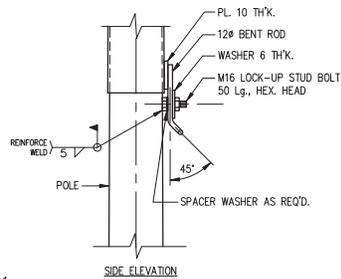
BRACKET FOR 3 FLOODLIGHTS
